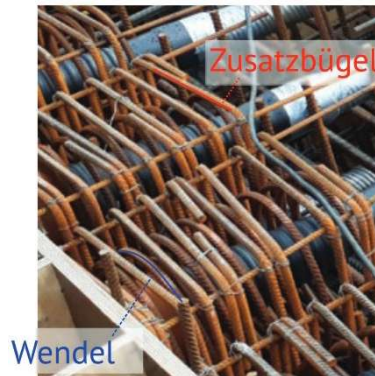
Detailing of reinforcement in Post-tensioning Anchorage Zones [11]
